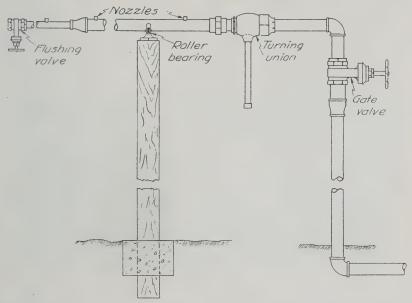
Detail of typical nozzle line assembly for hand rotation. The special fittings required can be secured from dealers handling sprinkler equipment. (From Ext. Cir. 4.)
